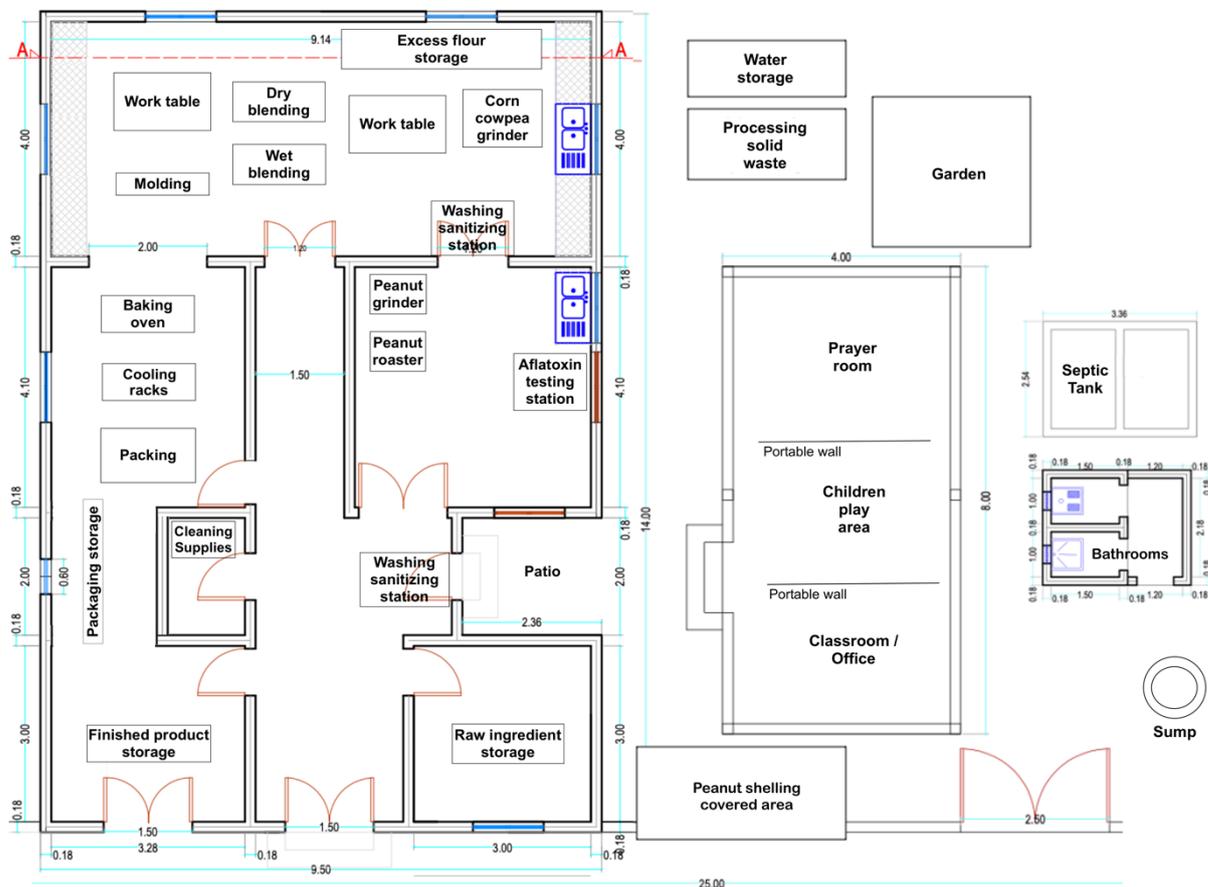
Bonbon Bouye plant floor plan (approx. 25 x 14 meters).¹
